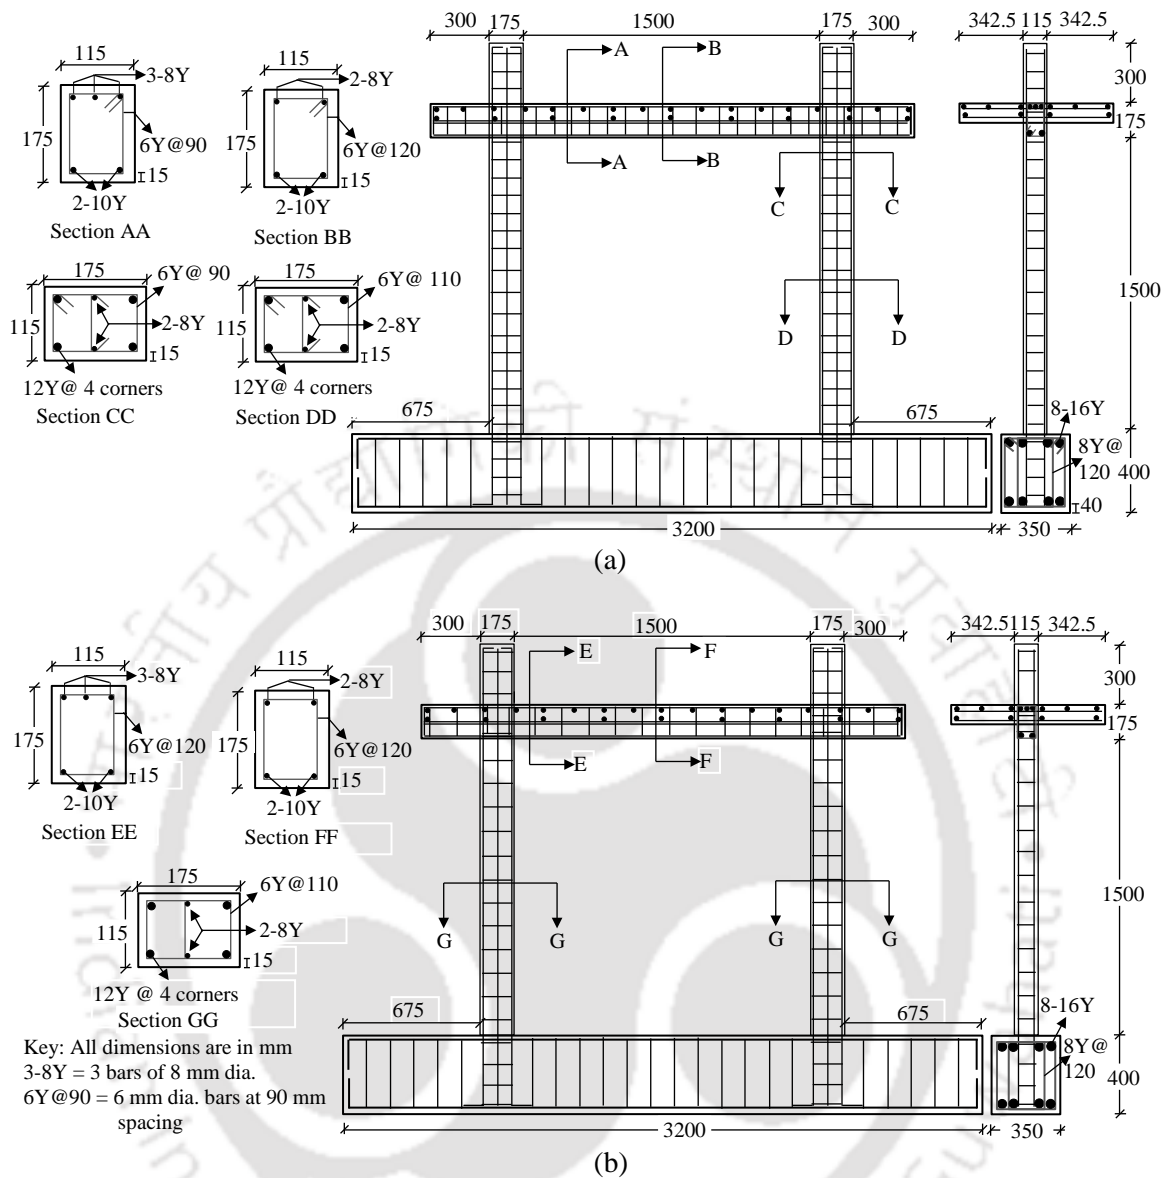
Reinforcement detailing of: (a) ductile frame; and (b) non-ductile frame model.
